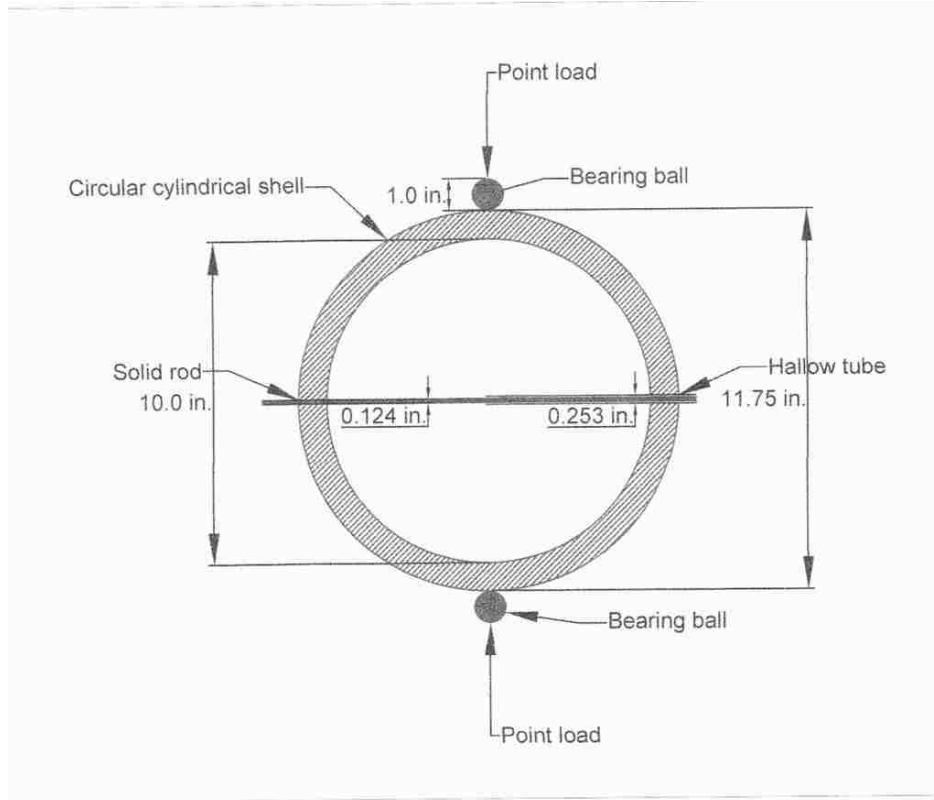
Section view of the HSSFRC Circular cylindrical shell set up
